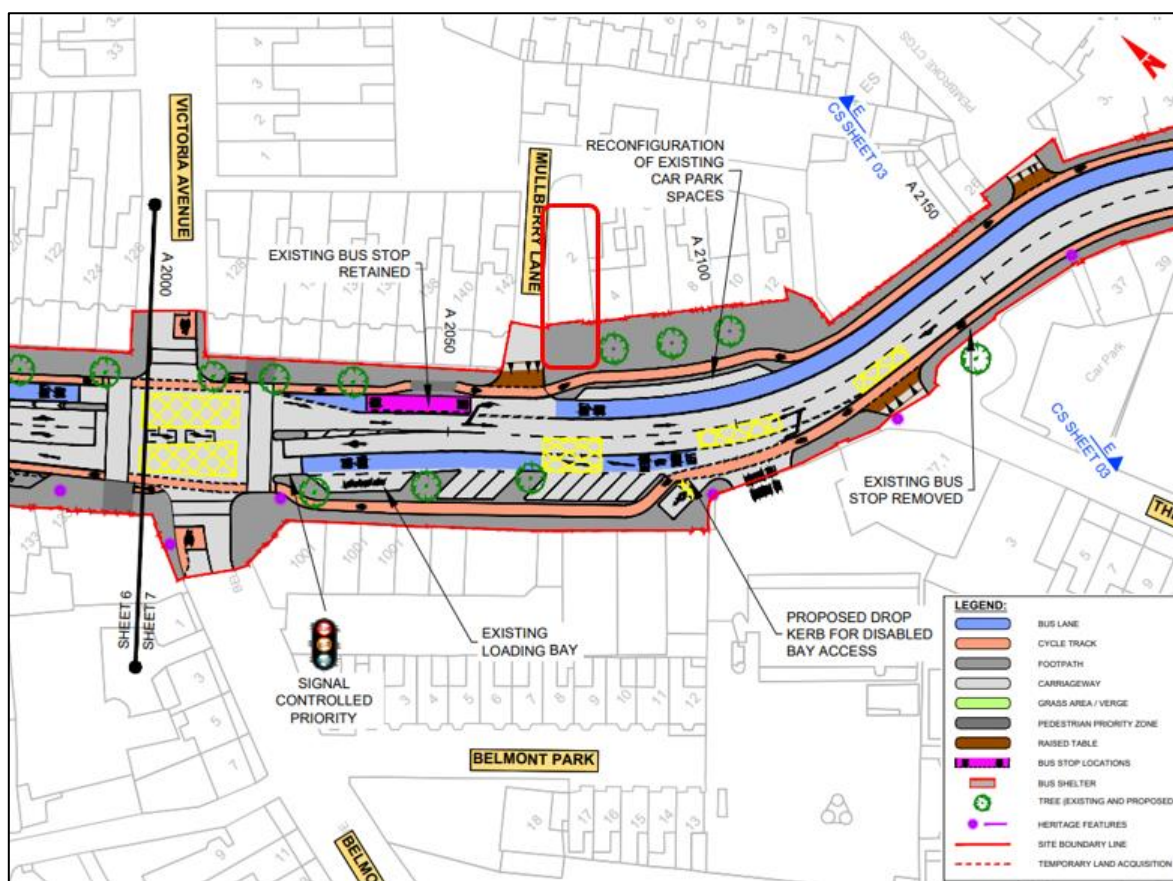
Extract from General Arrangement Drawing at No.55 to 61 Donnybrook Road (Sheet 06)
